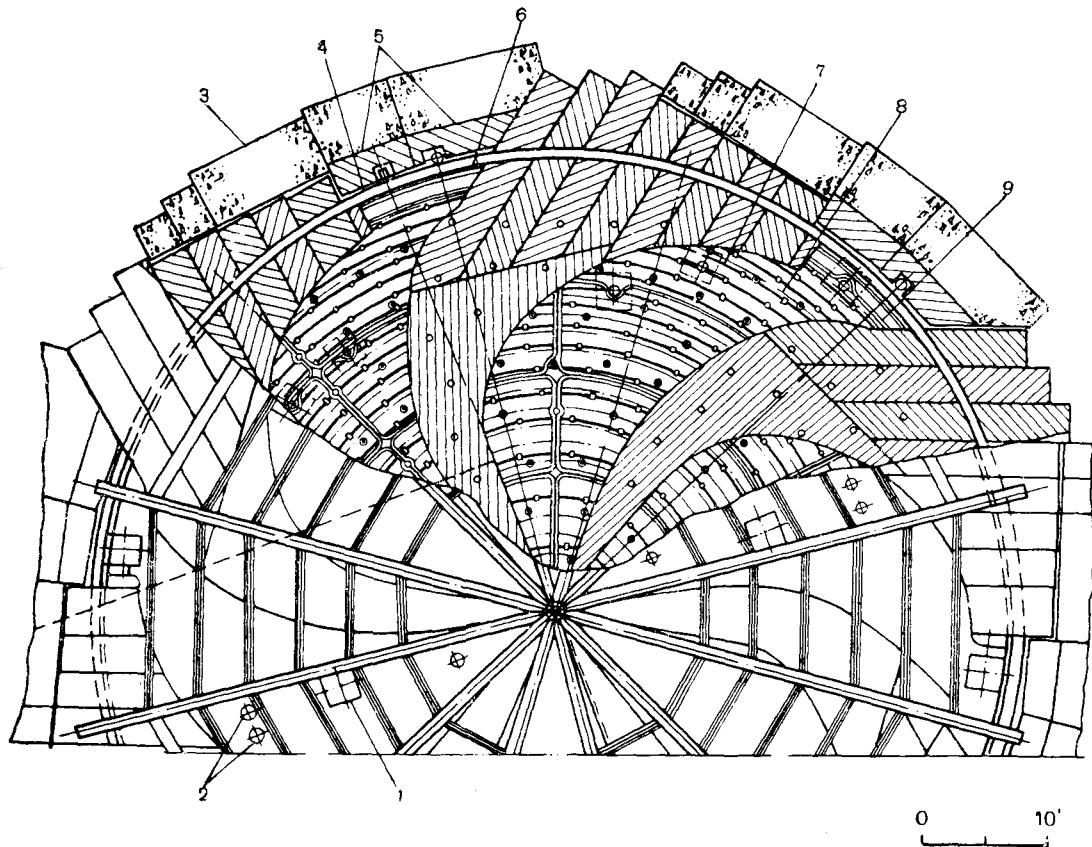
Plan view, showing spiral shape, tank support frame, main coil, and other indicated details of the design:
